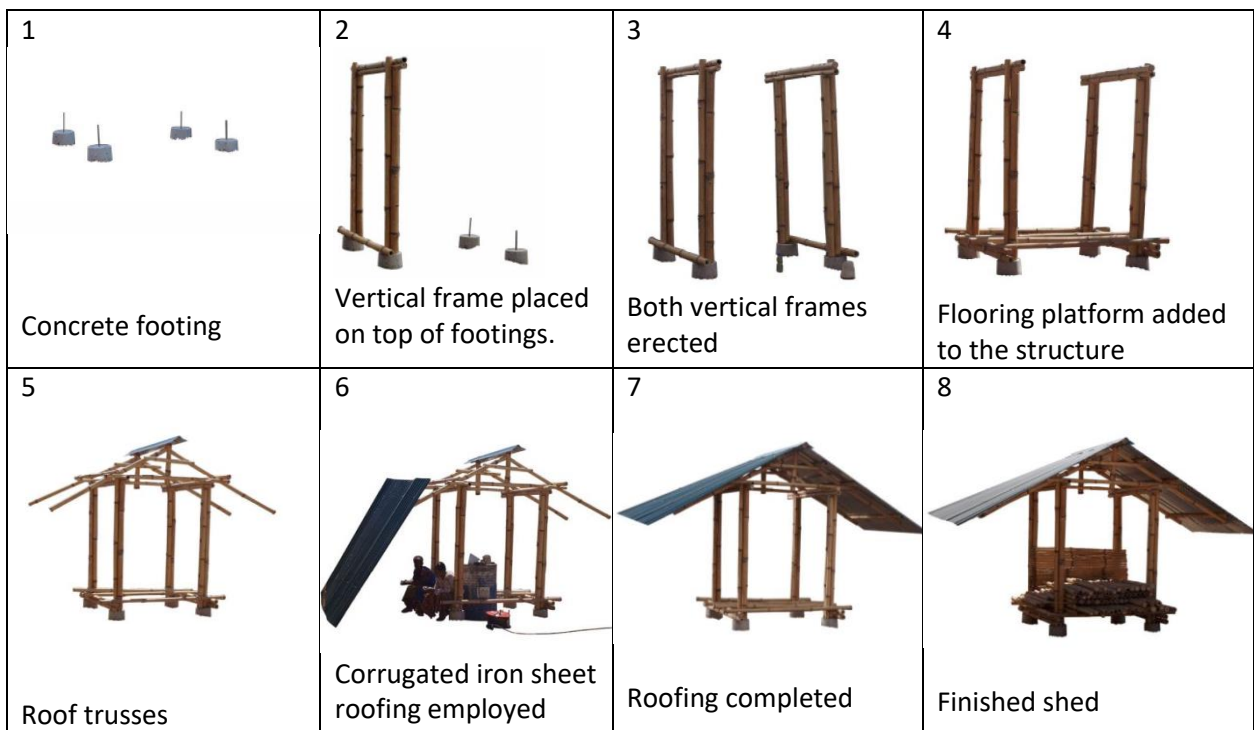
Alternative method of bamboo construction, sequence in construction of a bamboo shed
